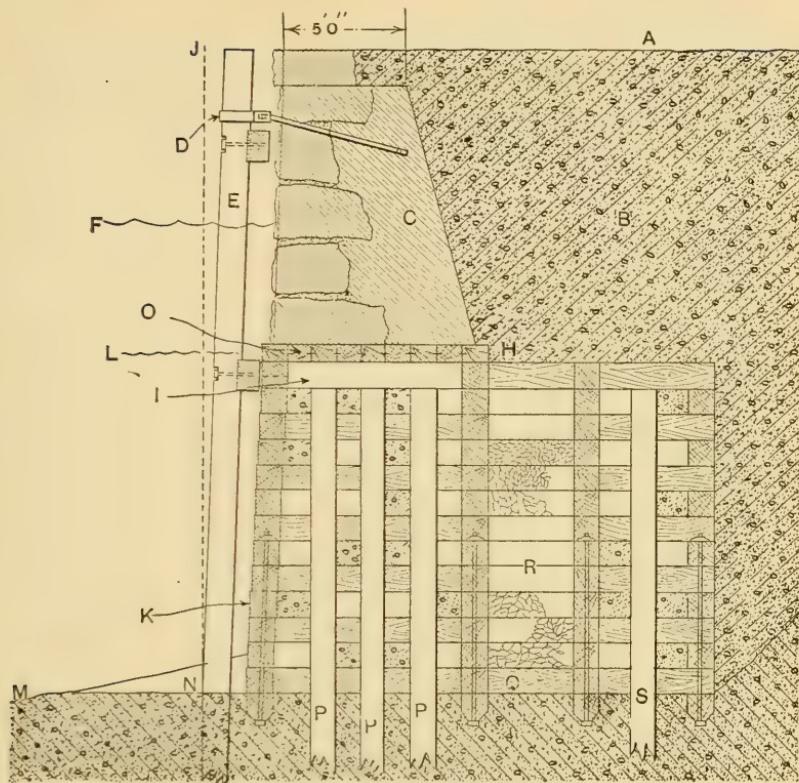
CROSS SECTION THROUGH CRIB AT PROVIDENCE, R. I.
